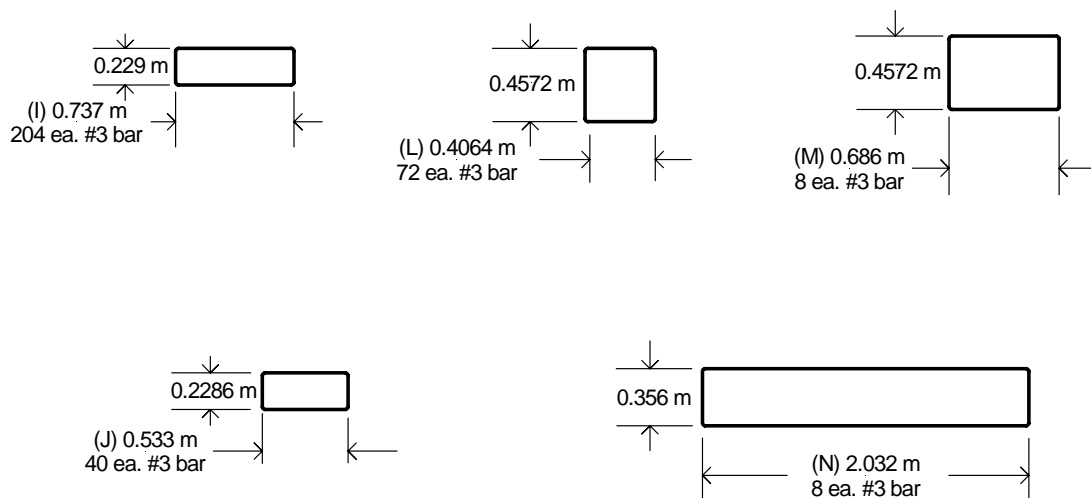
Hoop steel details used in the retrofitted grade beam
